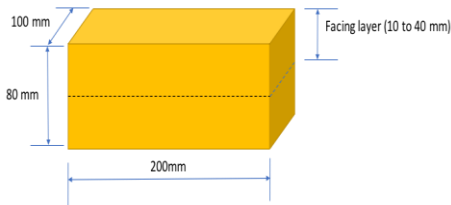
Illustration of double layer rubberised concrete paving blocks specimen series
